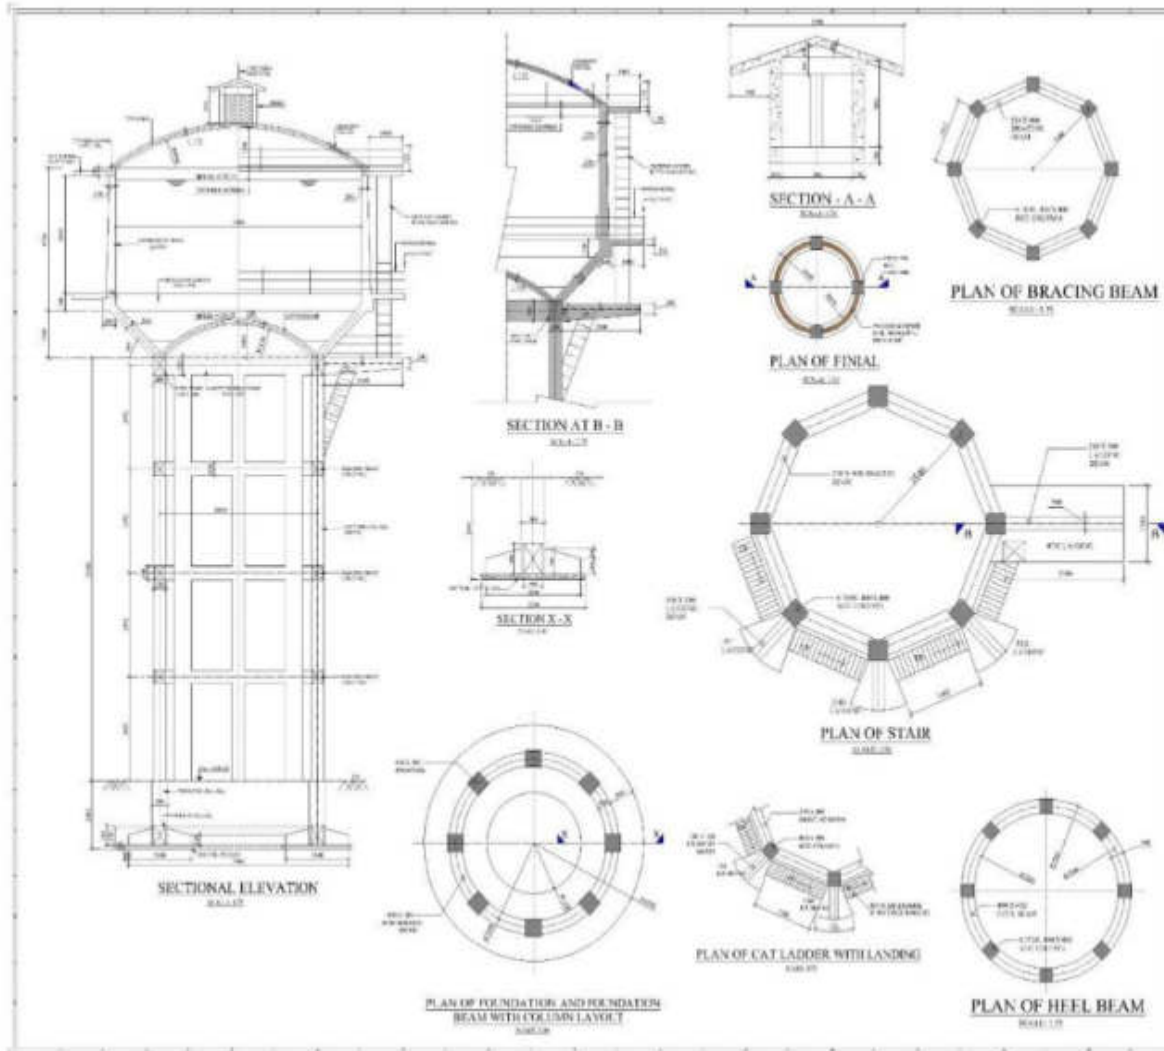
Proposed Layout Plan of OHT at Vitla Road zone-8
